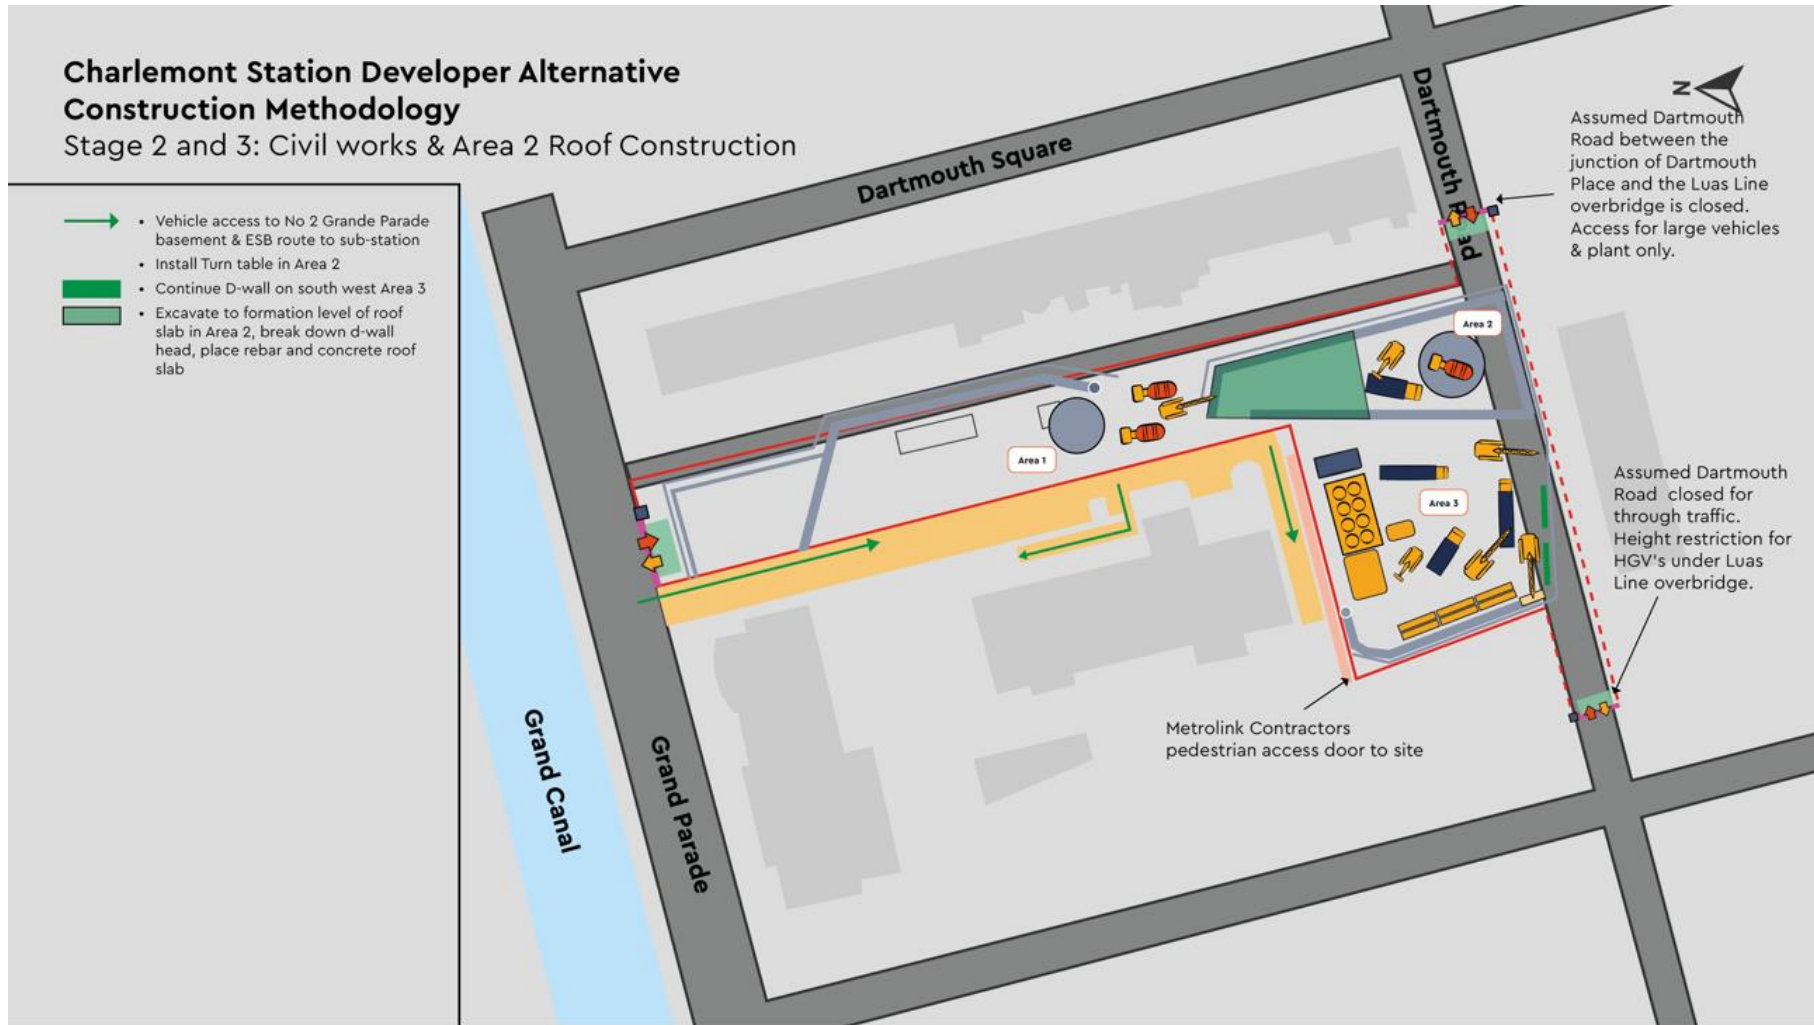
Charlemont Station – Stage 2 & 3 – Civil works & Area 2 roof construction
